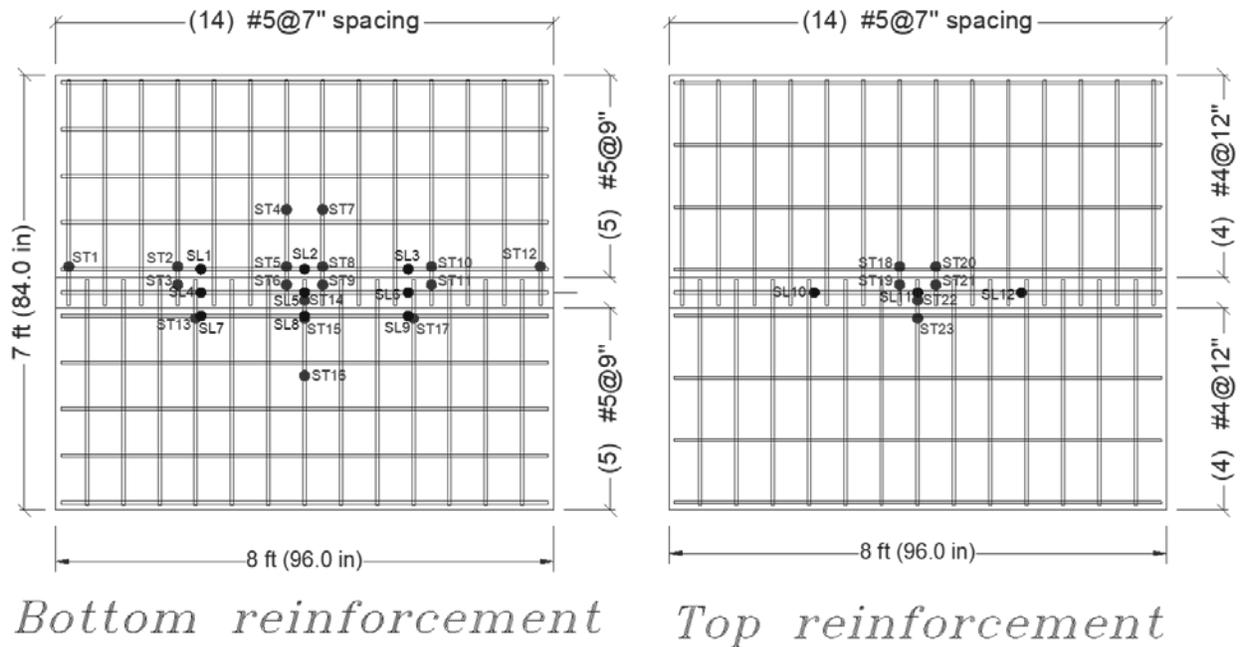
Structural details and instrumentation plan for the first transverse specimen (SP-1).
